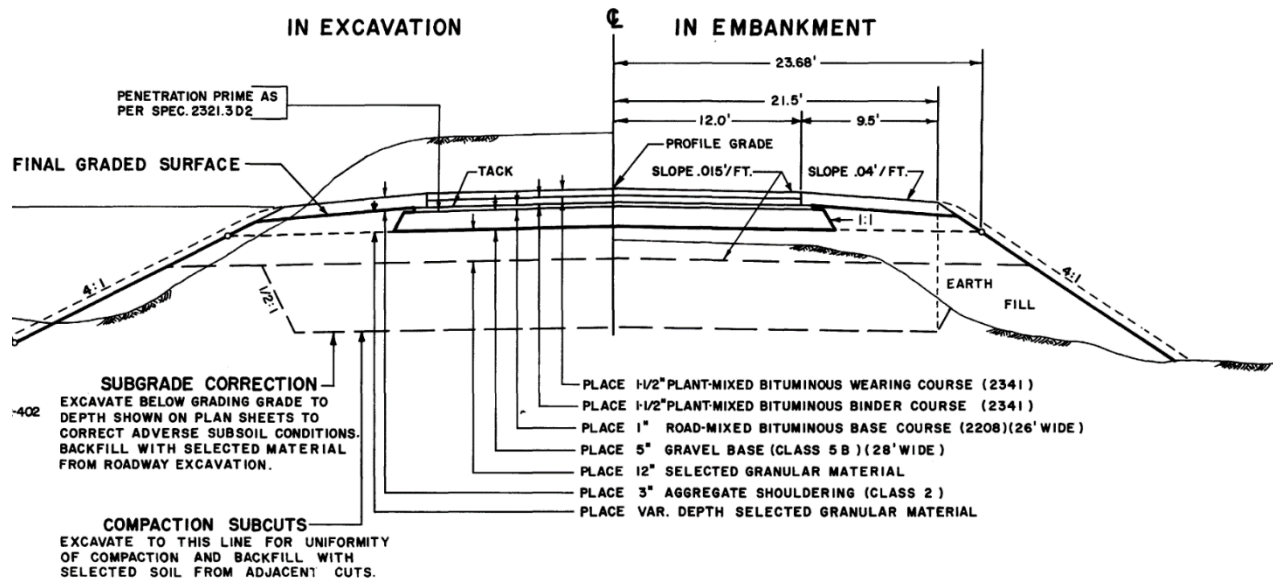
TH 71 mainline typical section (1967 construction plan)
